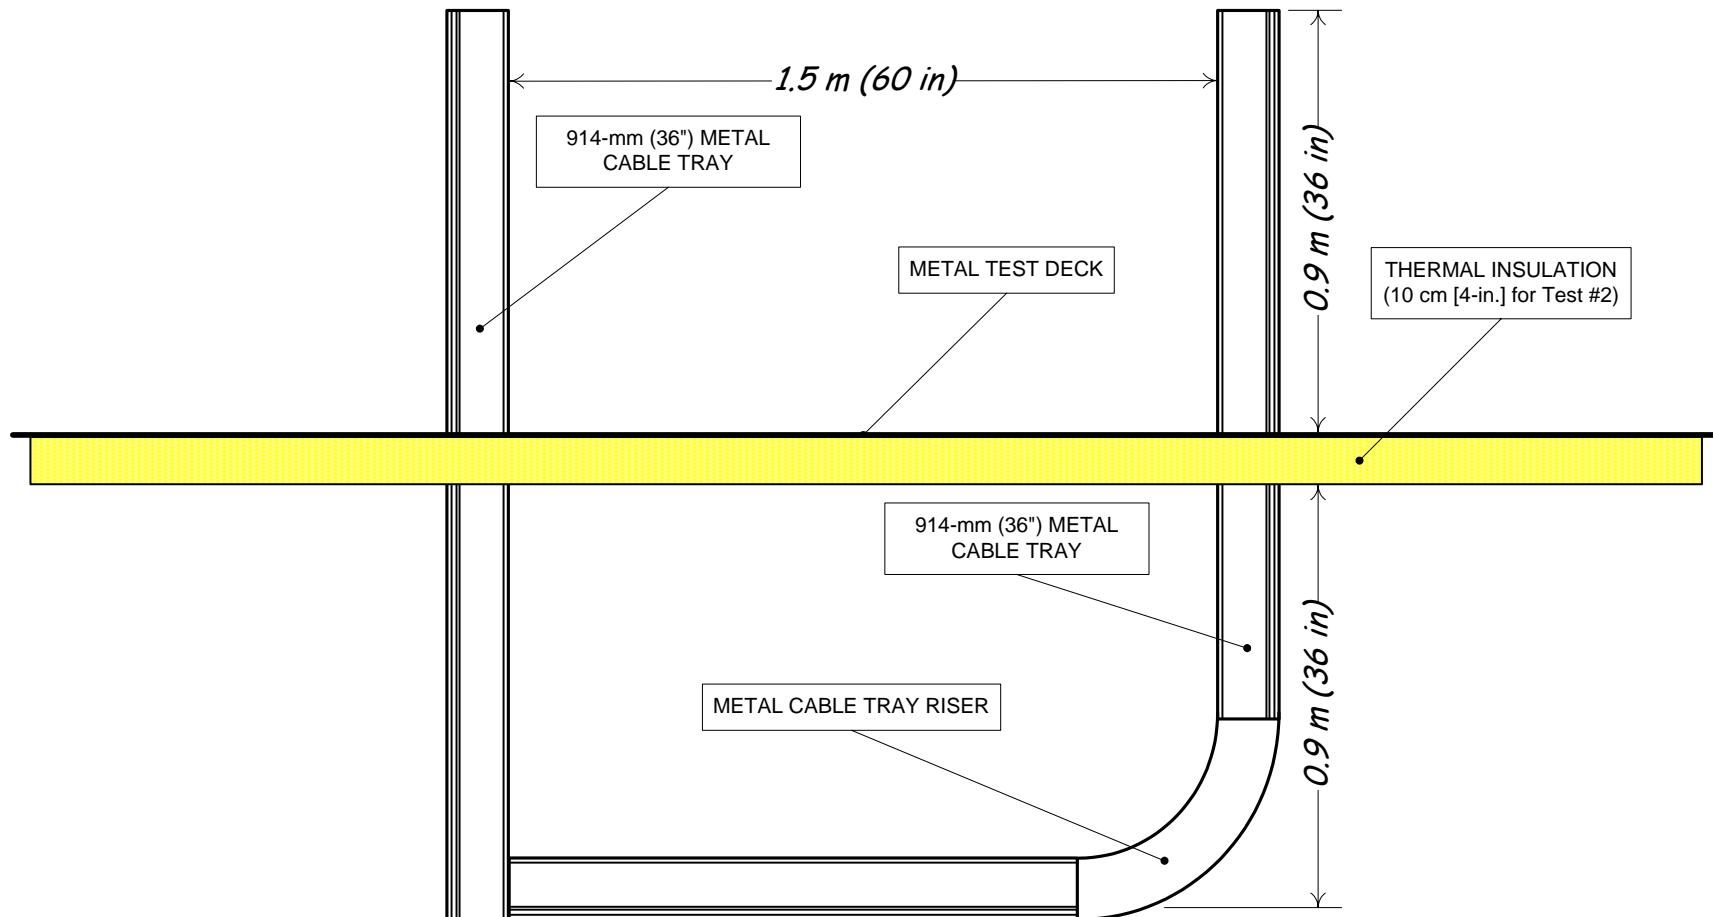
914-mm (36-in) cable tray test specimens (side view with dimensions). Cable trays will be ladder type, 18-gage galvanized steel with 10 cm (4 in) high side rails and 23 cm (9 in) rung spacing.
